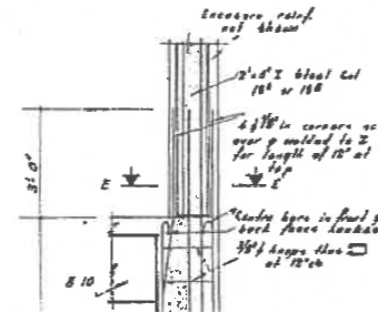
Extract of original steel mullion to foundation detail (critical connection)
